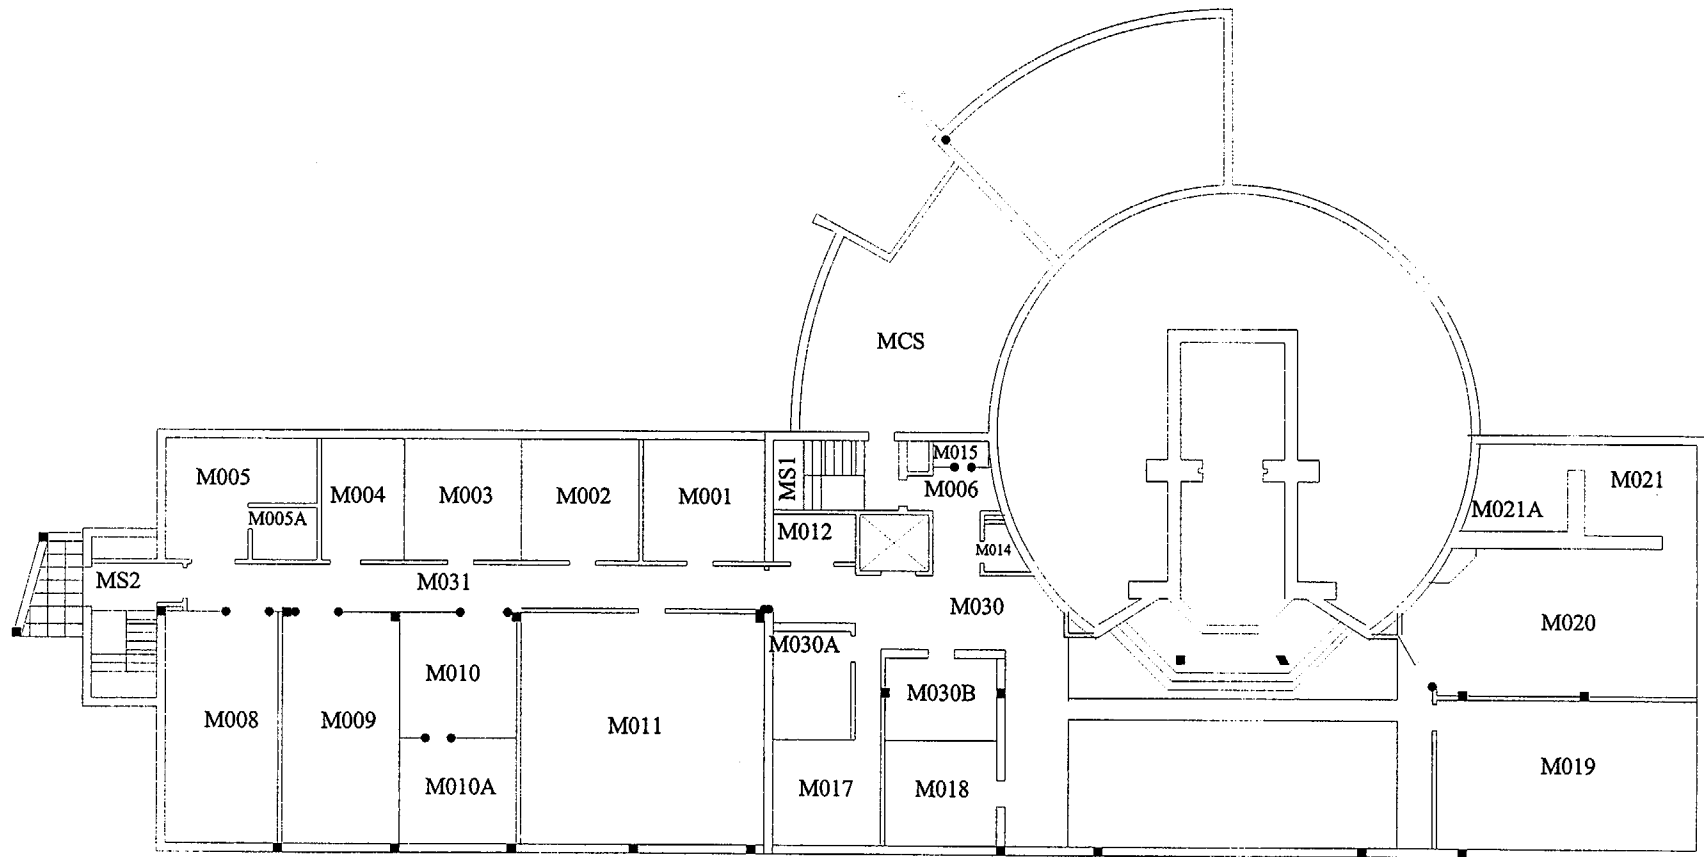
UVA Reactor Mezzanine Floor Plan View
